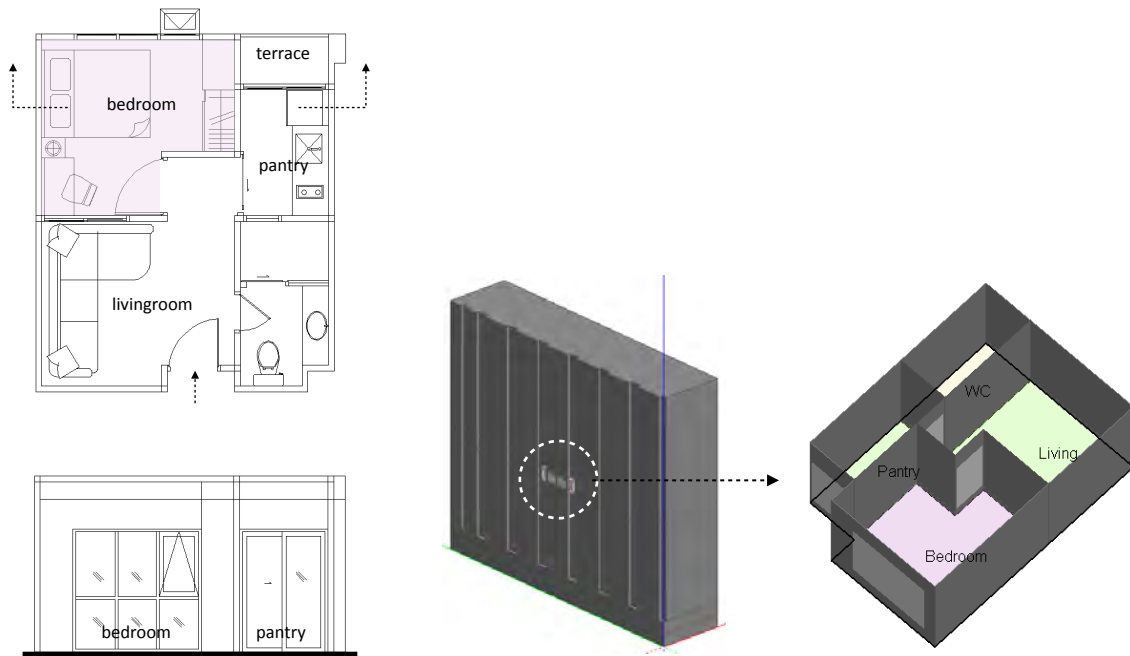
The studied unit: (left) layout and elevation towards the external wall, (middle) the location of the studied unit in the studied building and (right) the simulated studied unit.
